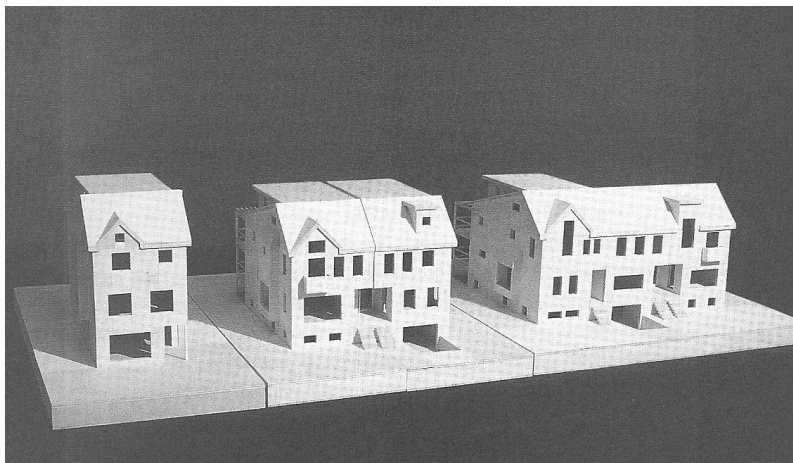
The proportions of the Next Home enabled planners and builders to build the structure as a detached or semi-detached dwelling, or as part of row. The model shows the front elevation of such configuration (Friedman, 2001).
